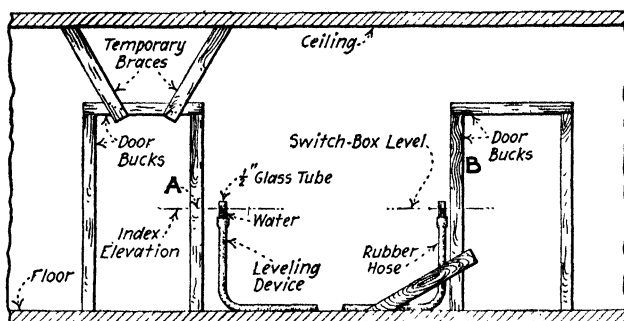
Hydraulic conduit-box levelling device being used for locating all switch boxes at the same elevation at door bucks.
